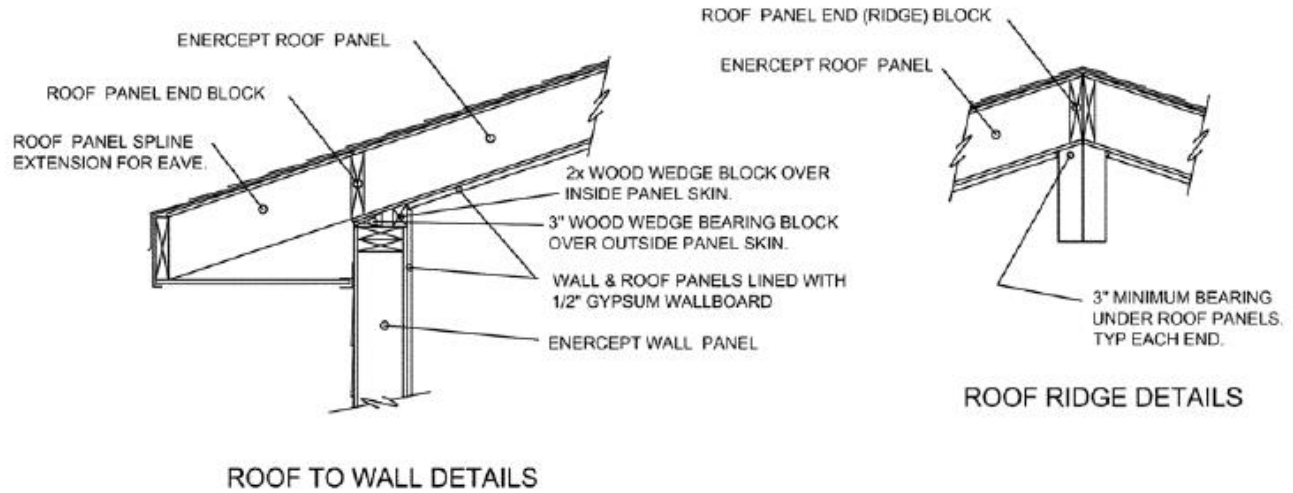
TYPICAL WALL AND ROOF PANEL CONSTRUCTION
